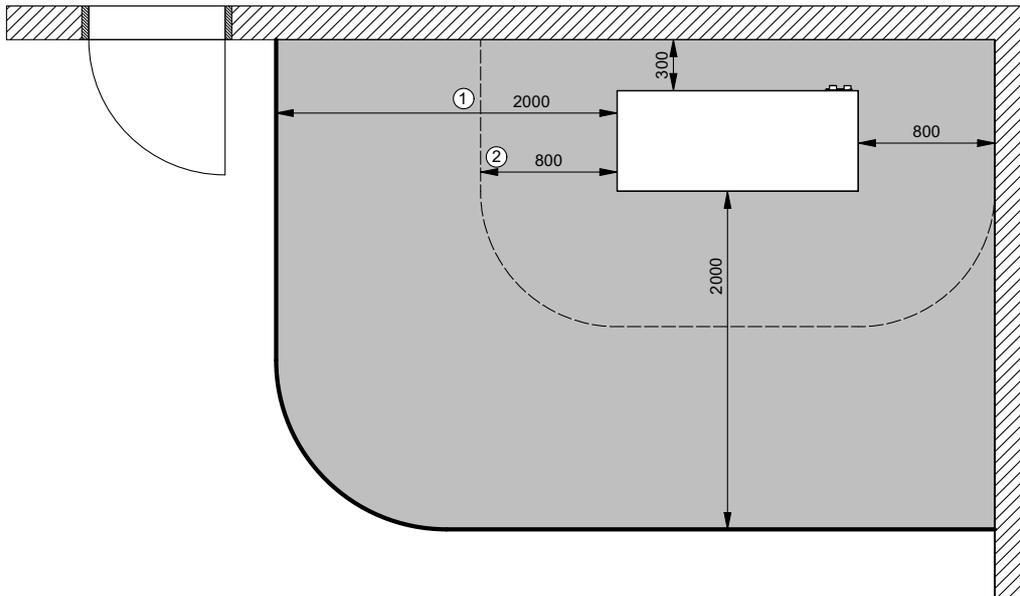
Safety zone (floor level installation) for installation in a corner
